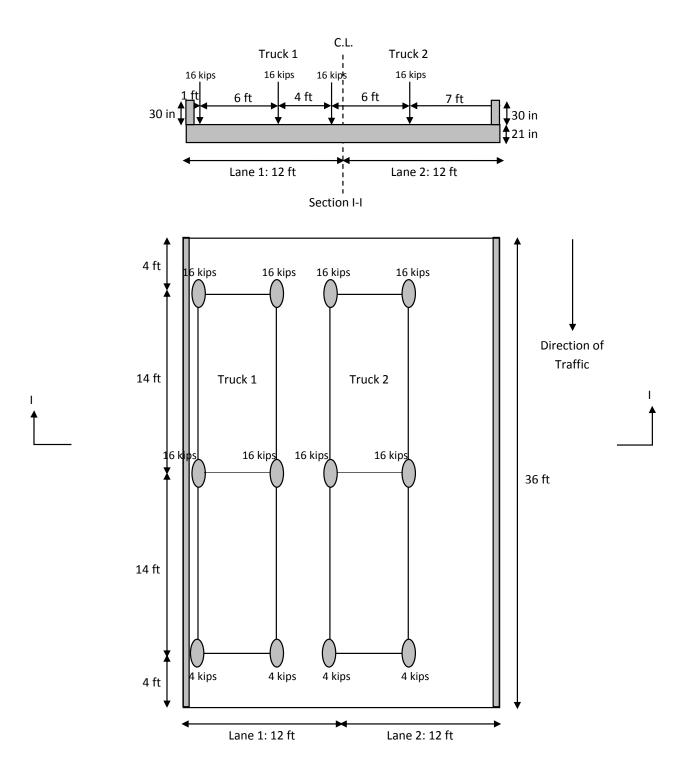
Typical Cross-Section and Plan of a Two-Lane 36 ft Span Straight Bridge with two Railings under Edge Loading E1.
